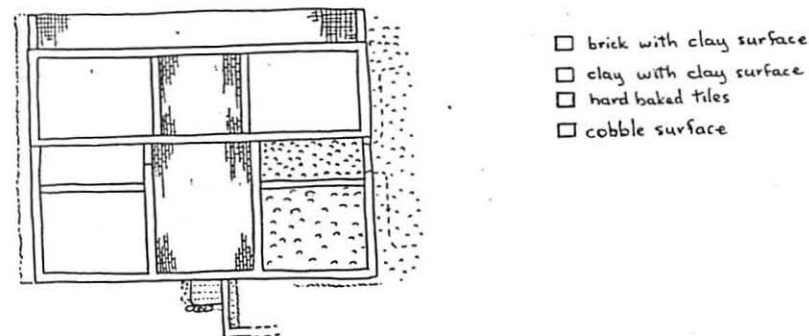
The groundplan of the house with its floor types as it was by c.1800, prior to the fire.
